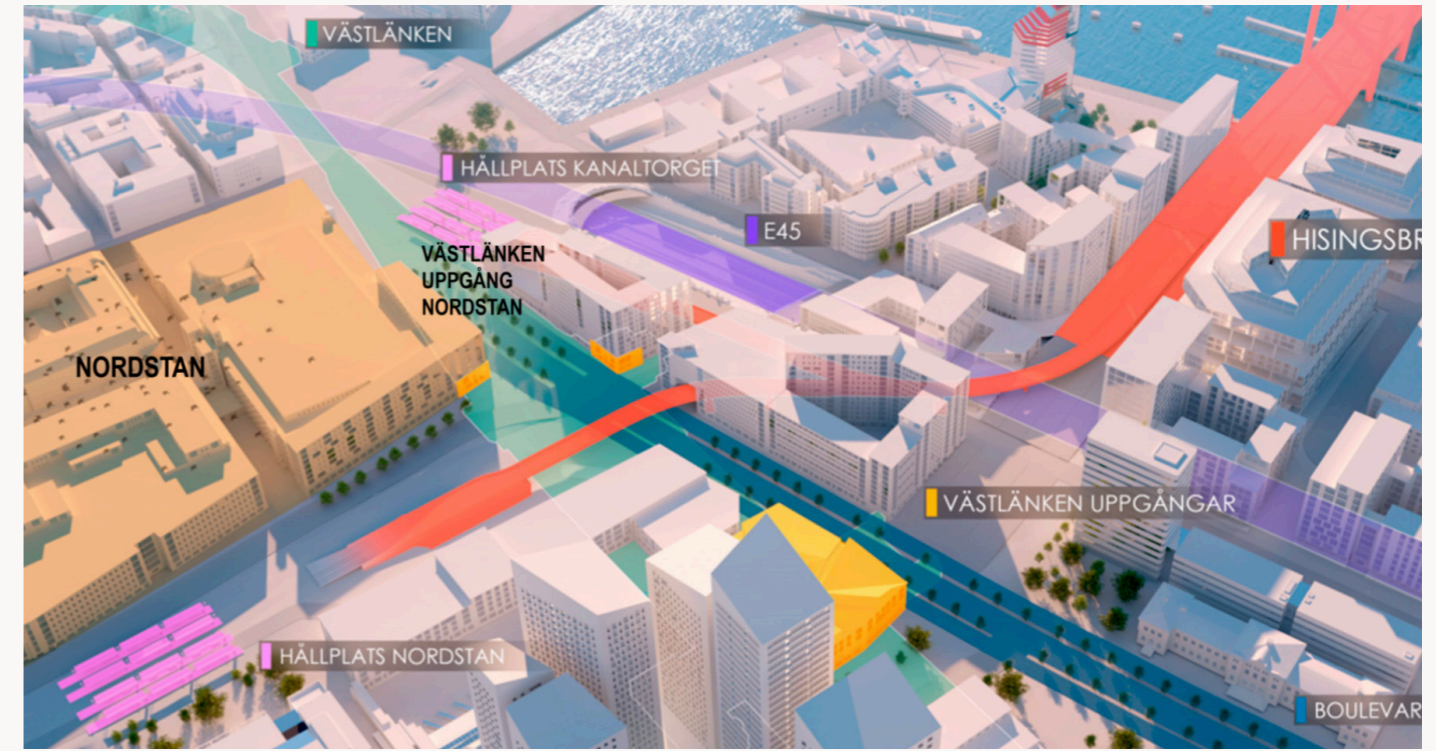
Development Plan for Västlänken's infrastructure expansion. (Akuro, n.d.)
